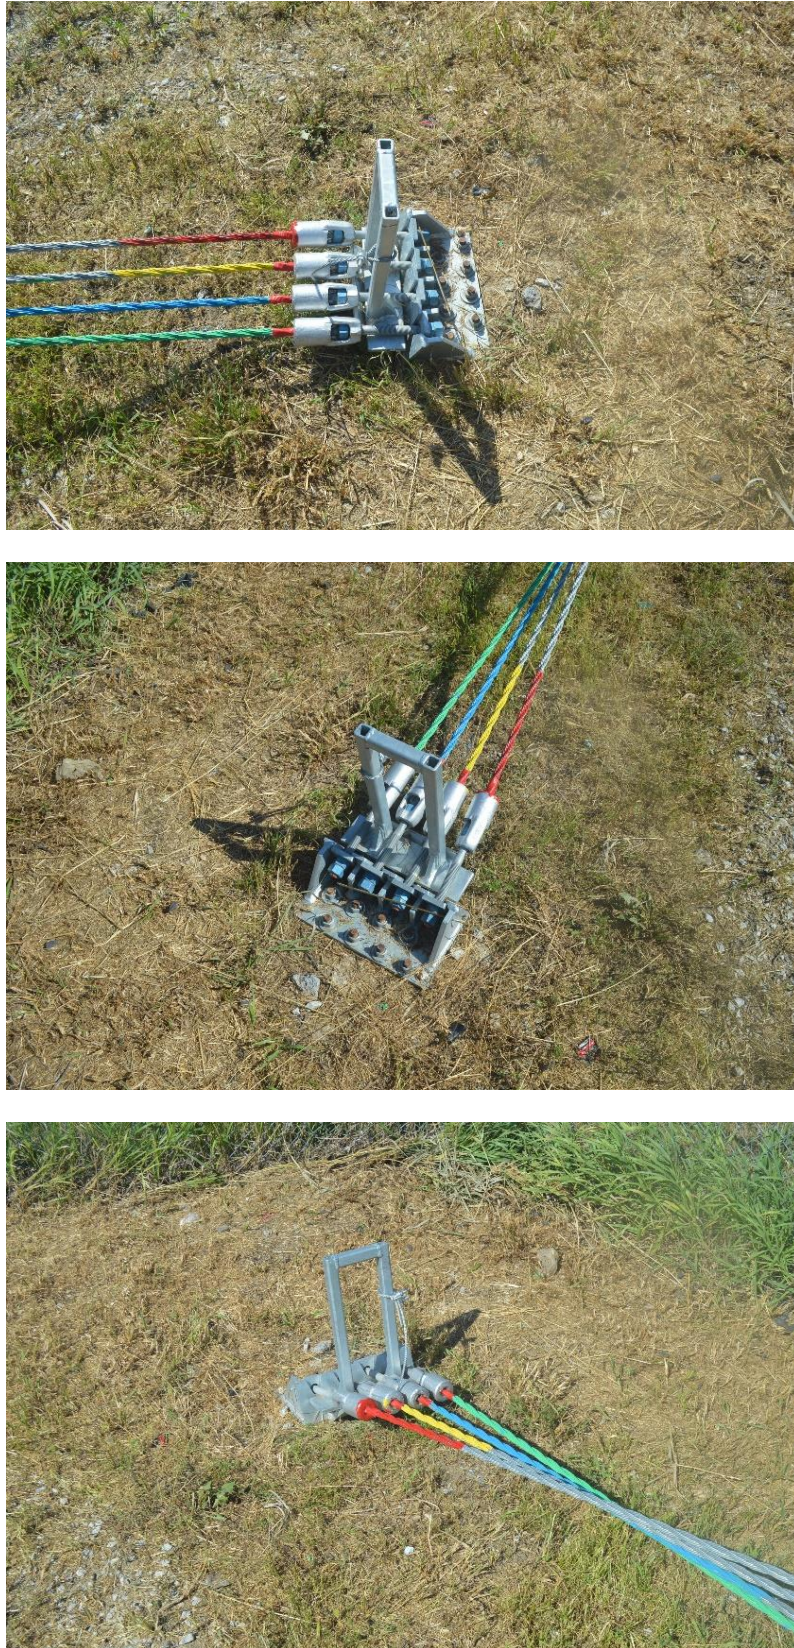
Post-Test Downstream Anchor, Test No. MTP-2
